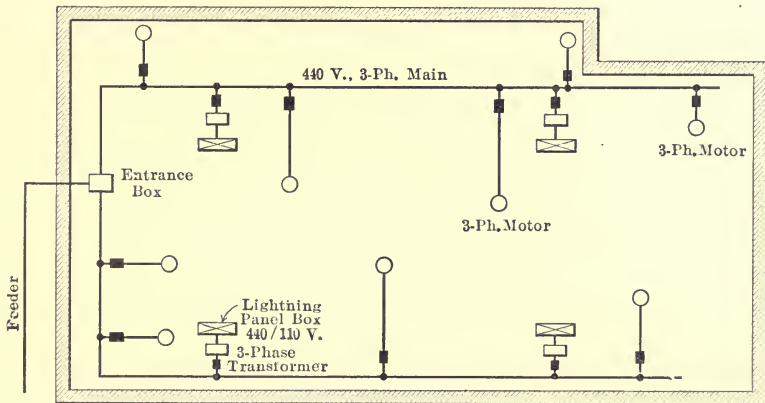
LIGHTING CIRCUITS FED THROUGH TRANSFORMERS.
